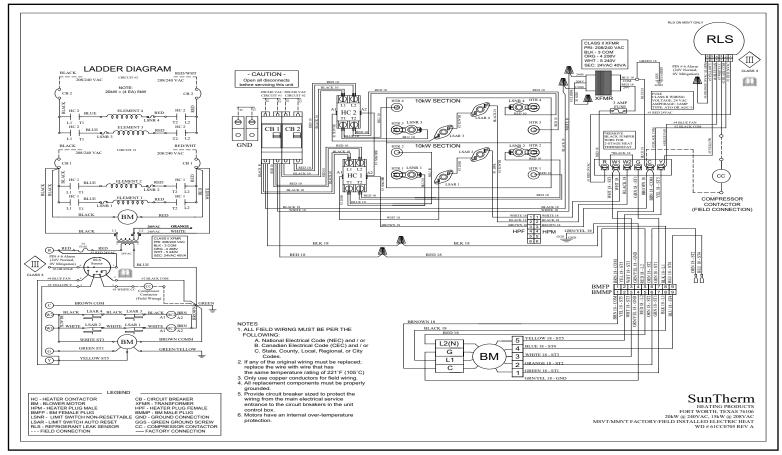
M*VT 37-72 – Constant Torque Motor – 20kW Electric Heater
